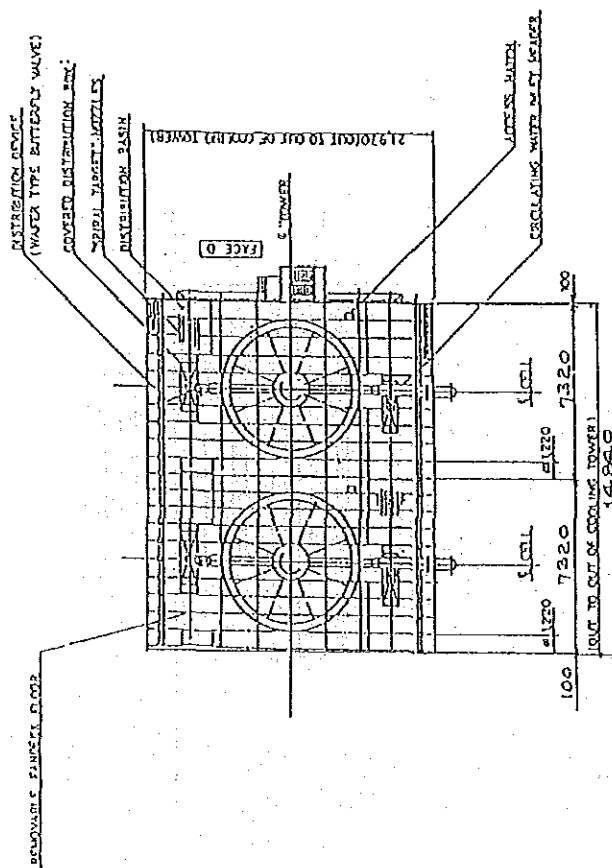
OUTLINE DRAWING OF COOLING TOWER FOR U #1
